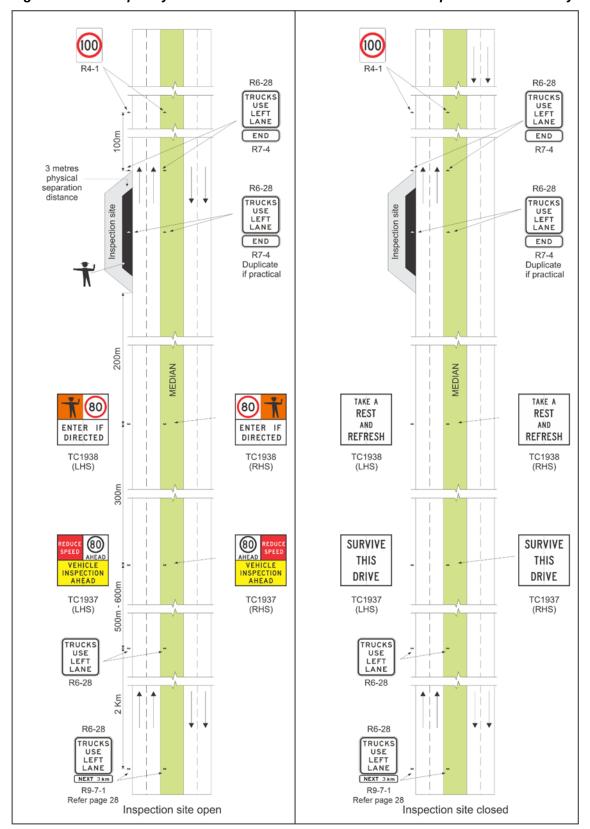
Example layout for divided multilane road with >3 m separation or barrier system
